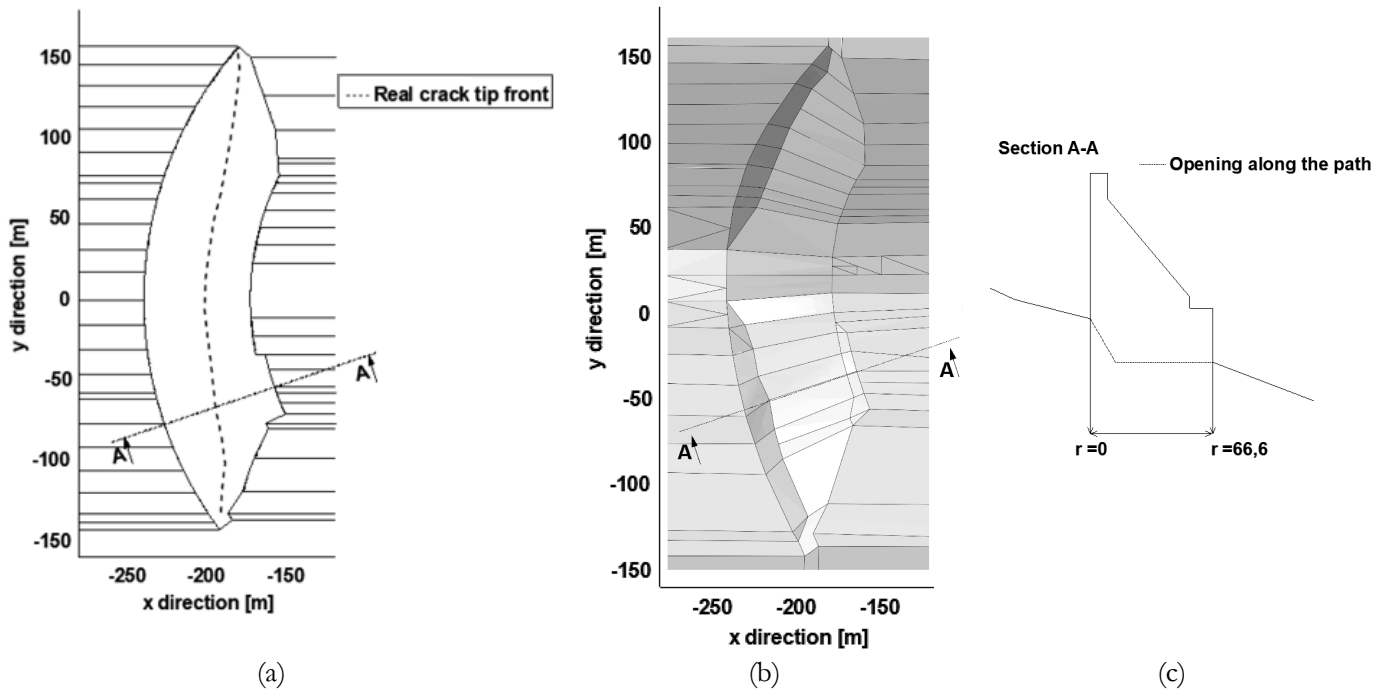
(a) Plane view of the dam/foundation interface; (b) Convergent excavation; (c) Dam section.
